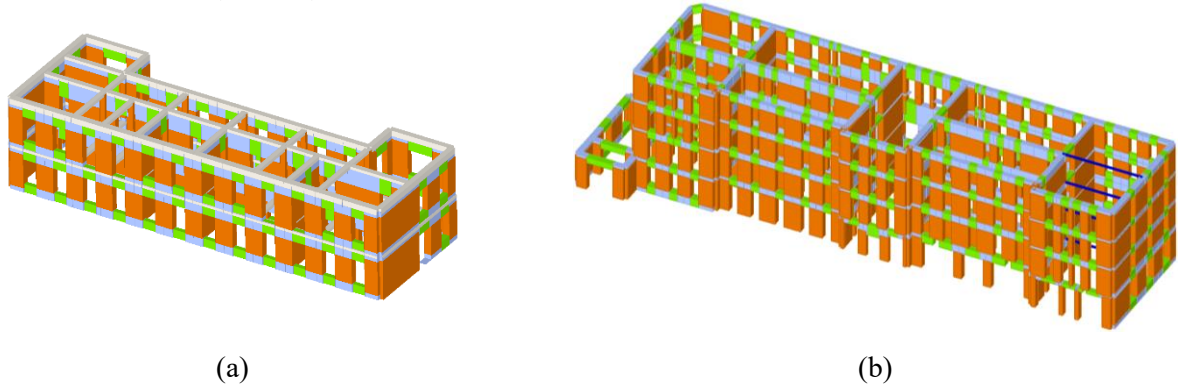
Equivalent frame (EF) mesh of a – Pizzoli and b – Sanremo town hall buildings.
